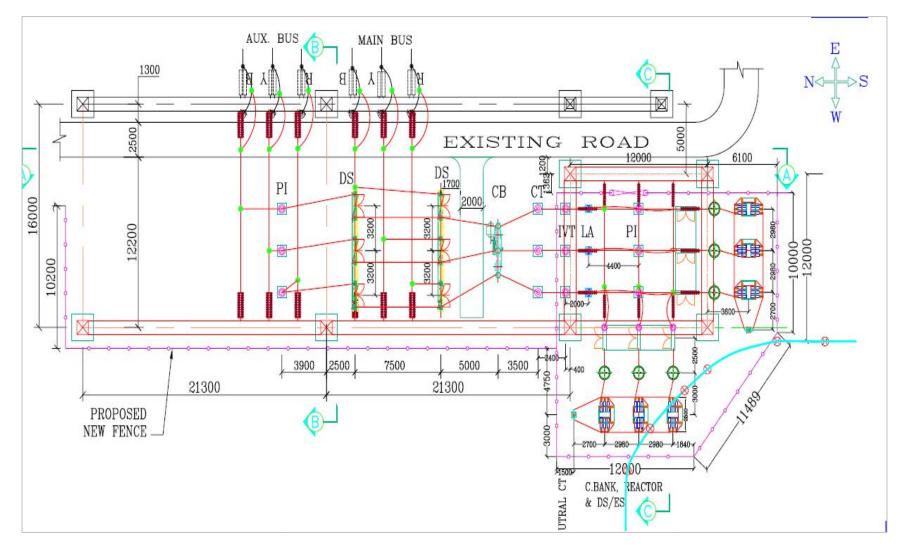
Layout Plan of a typical Substation that use Capacitor Bank
